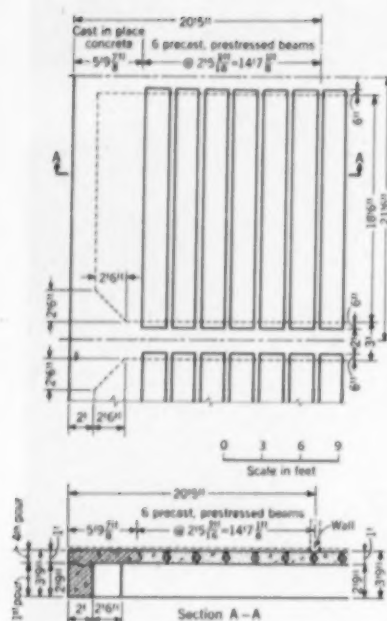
Plan and section show arrangement of pretensioned stringers, which rest on cast-in-place pile caps. Pile caps will be post-tensioned.
